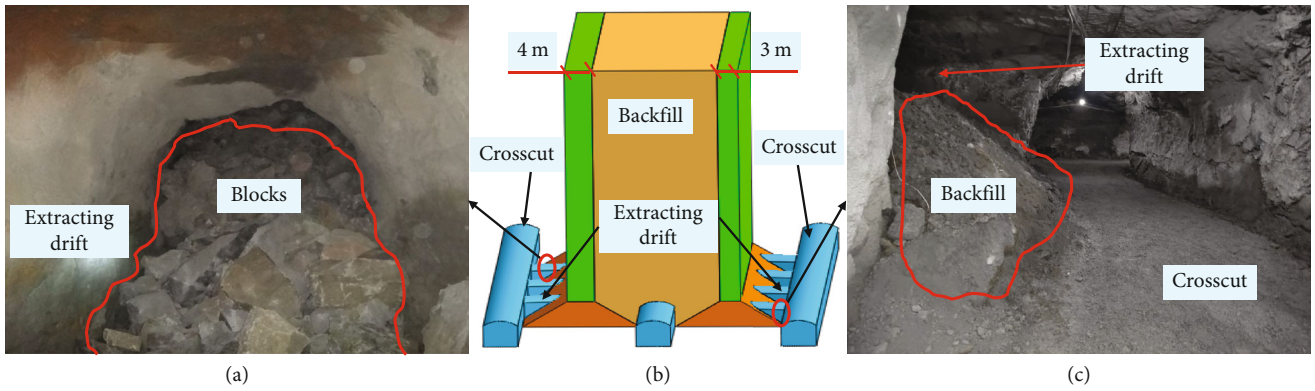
Reaction of retaining walls with different thicknesses after the second-step mining: (a) blocks from extracting drift, (b) stope bottom structure, and (c) filling mass from extracting drift due to collapson of retaining wall.
